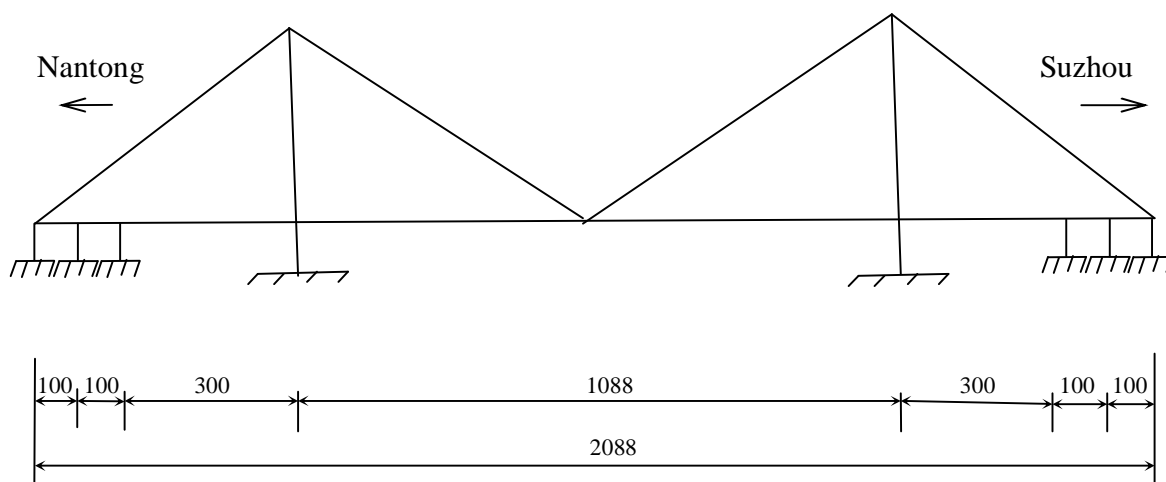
Schematic diagram of span arrangements with only outermost cables in Sutong bridge (unit m)
